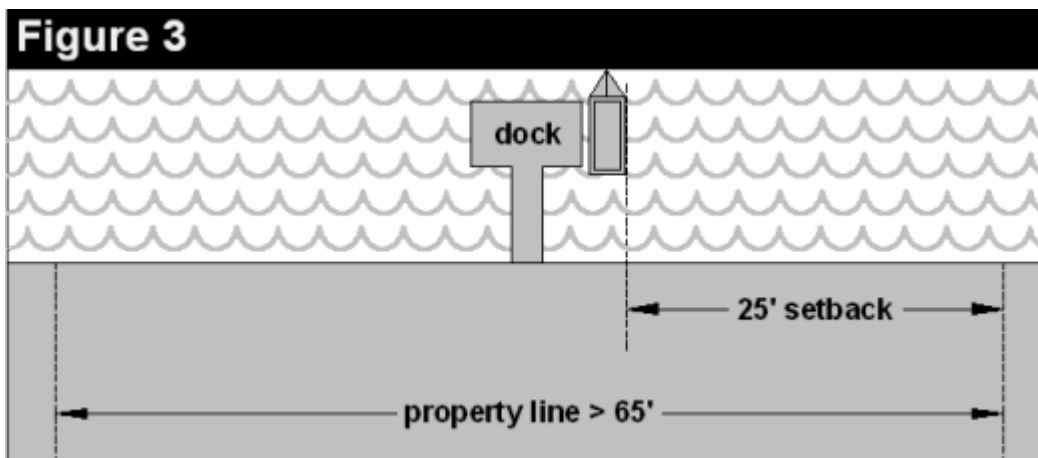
Dock Setback with Access Walkway and Mooring Area
